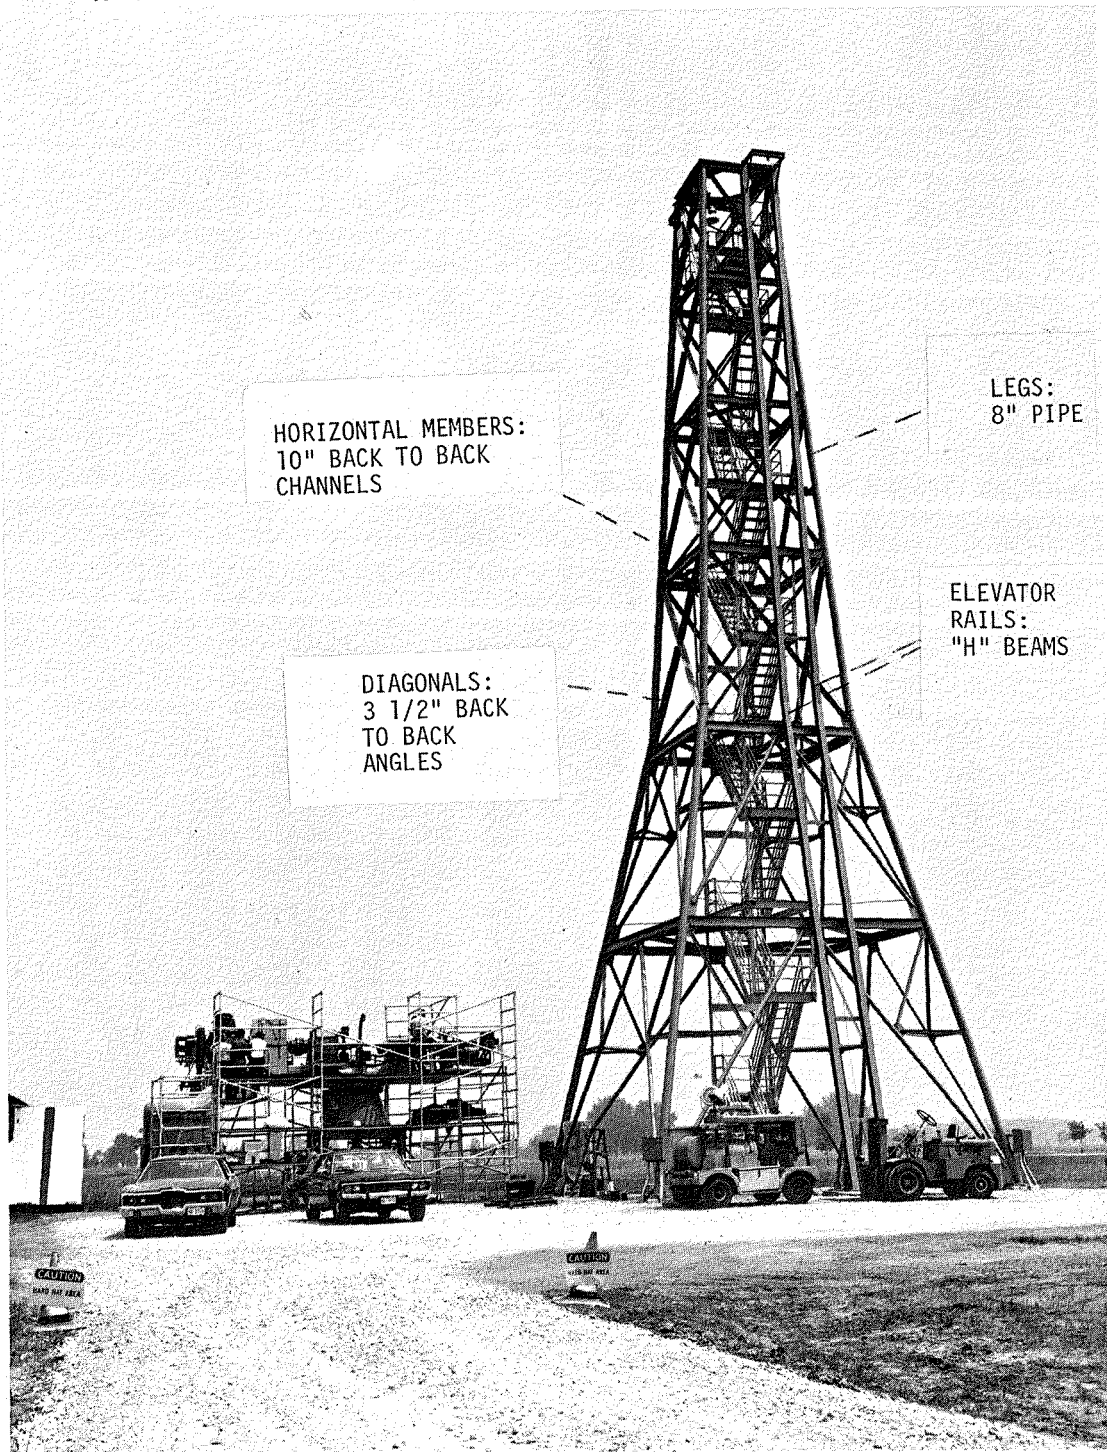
Original MOD-0 Tower with Service Stairs and Equipment Rails
